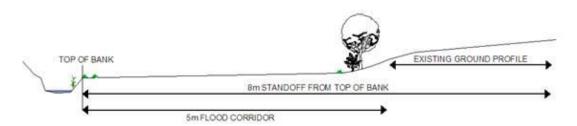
Proposed flood corridor expansion, indicative cross section
